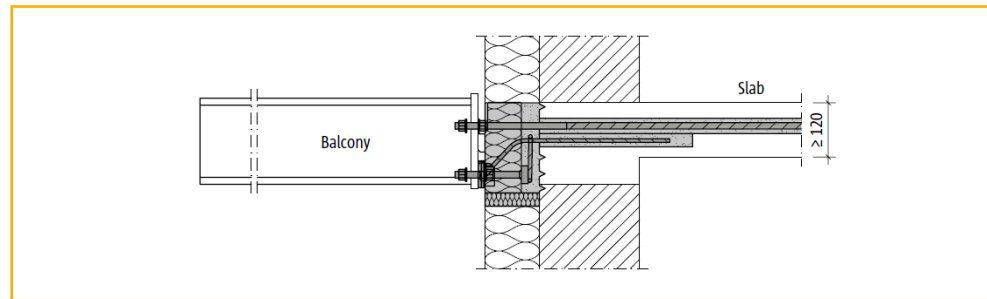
Connection with thermal insulation composite (TCIS) system and thin floor with type RKS
